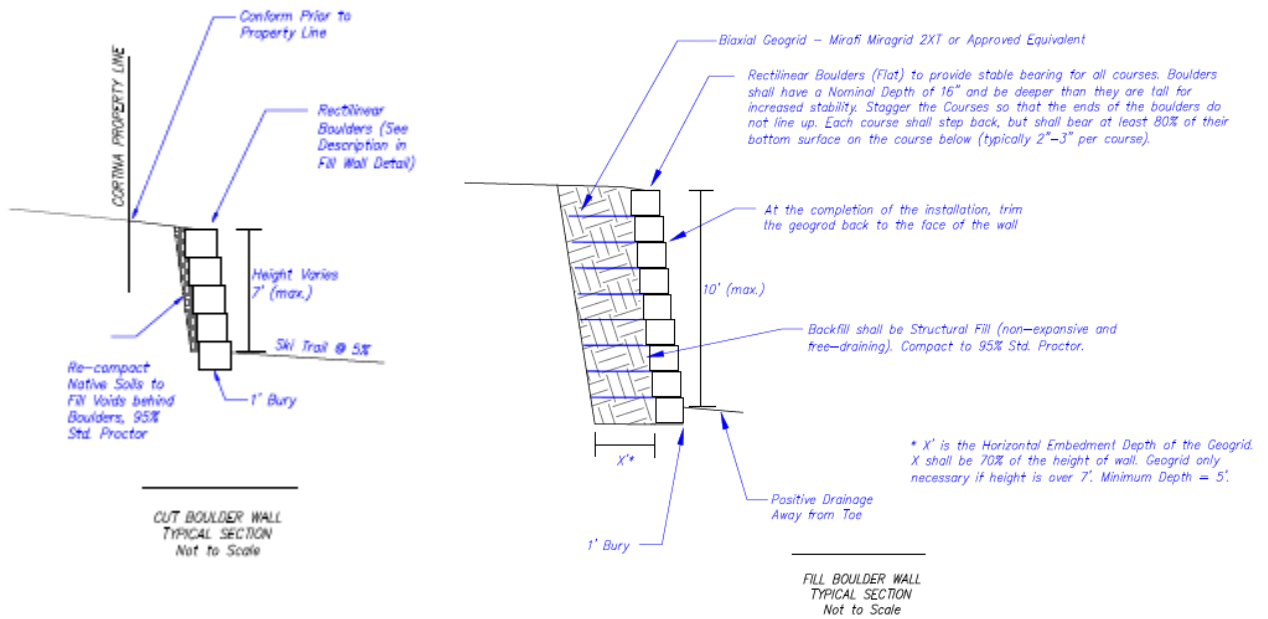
Retaining wall (Cut Boulder Wall, left; Fill Boulder Wall, right)
